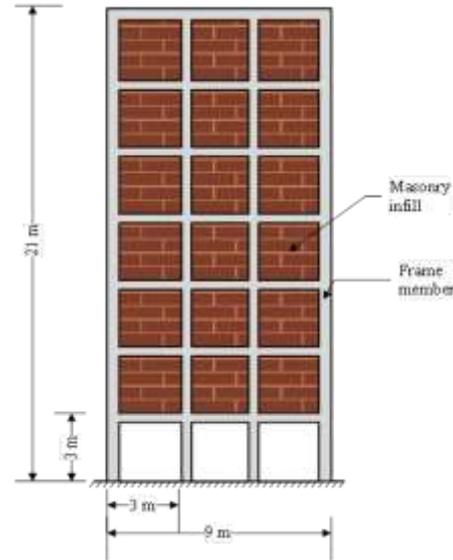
Building model for study from [8]. The model is showing masonry infill at all storeys except at first storey which is termed as soft storey.
